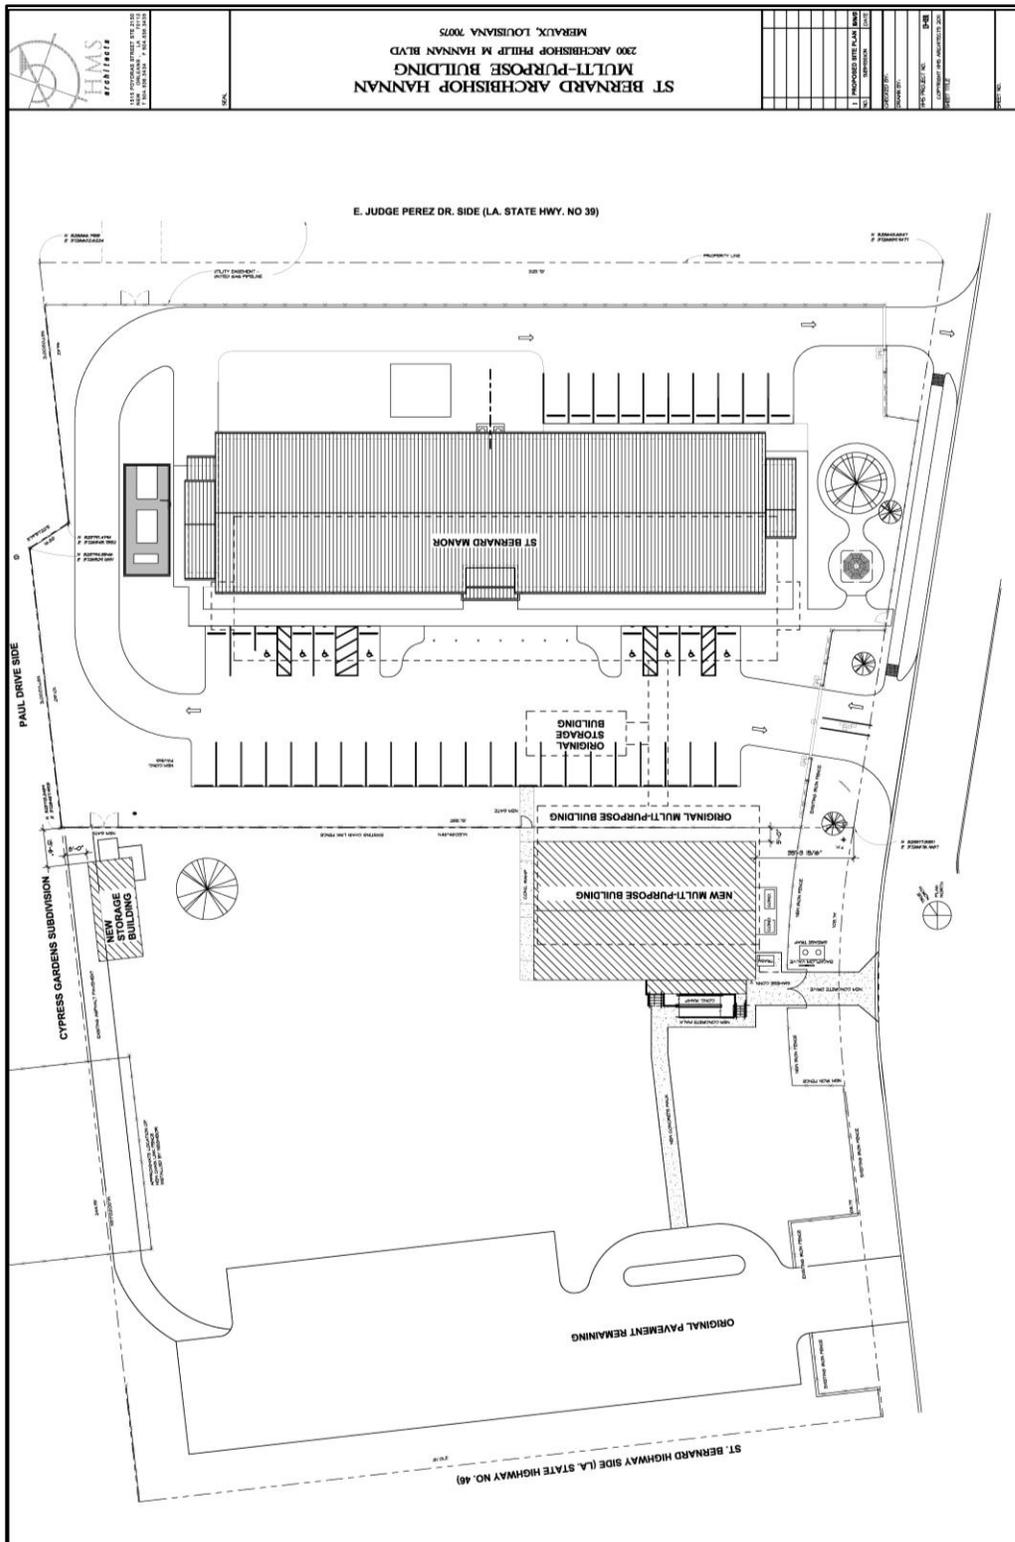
St. Bernard Manor-proposed site layout of multi-purpose building and maintenance building at location A
